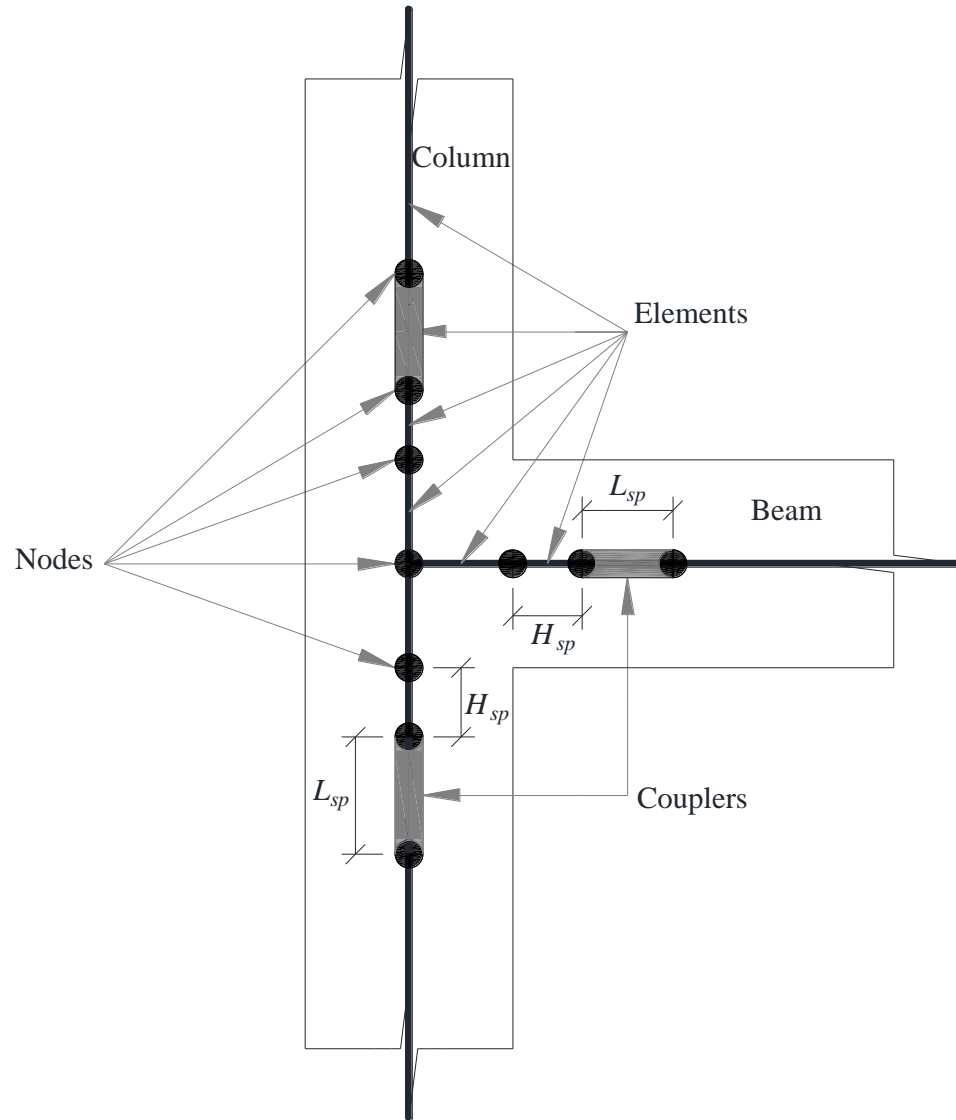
Finite Element Model for a Typical Beam-Column Joint
